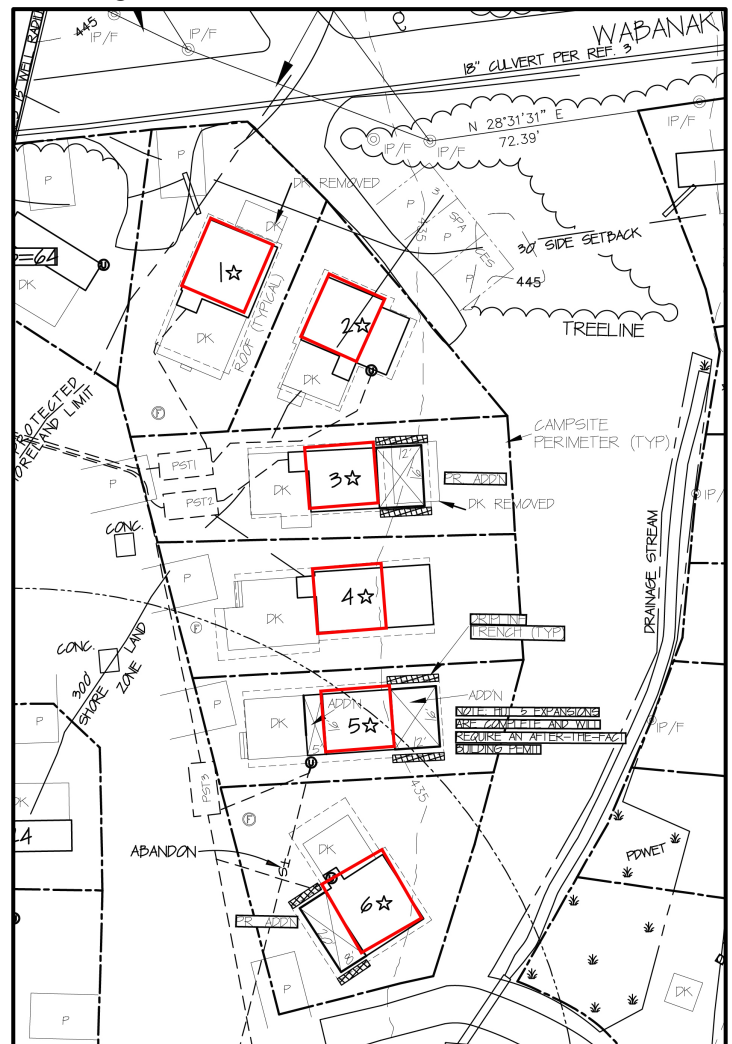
Hutnicks From White Mtn. Plan on Horizons Plan
